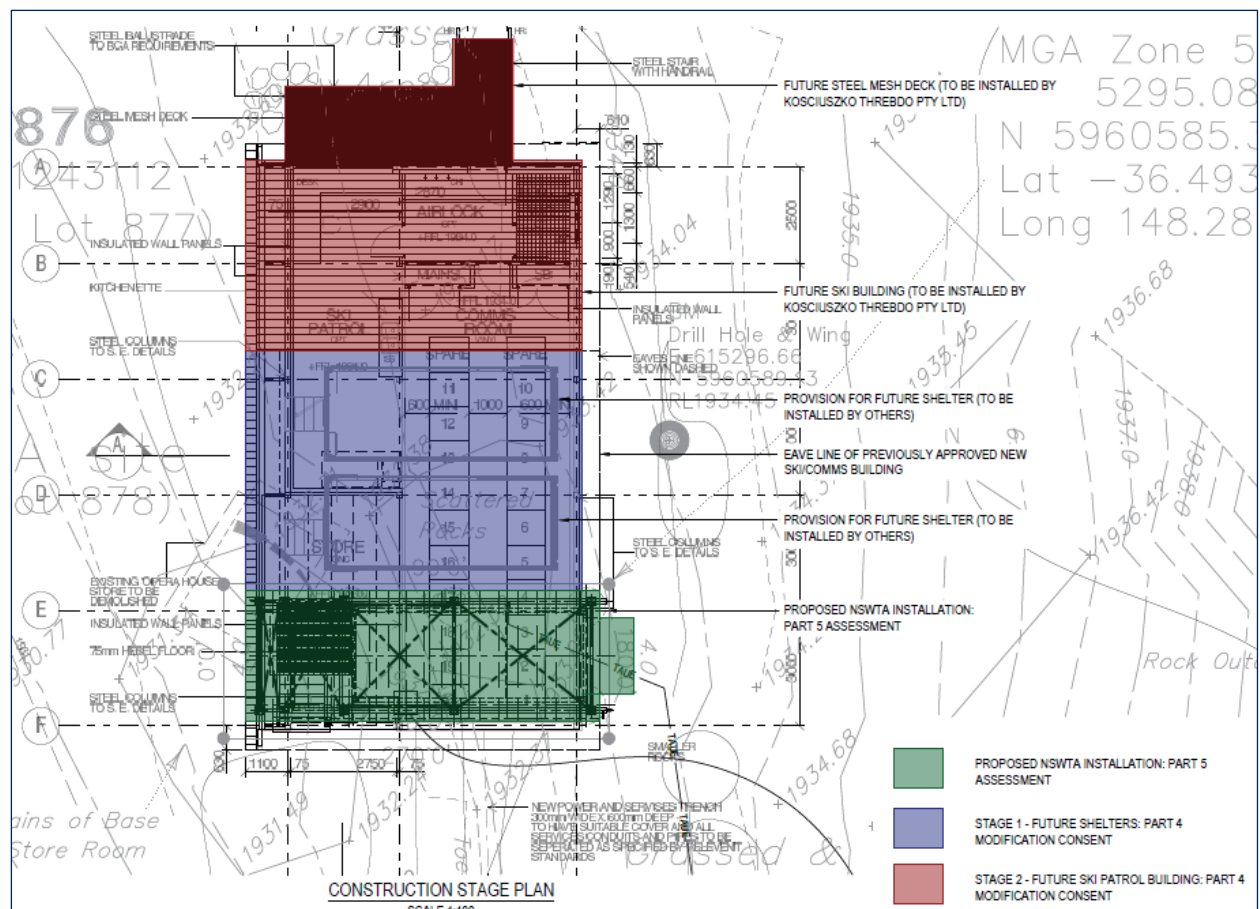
| Proposed layout of proposal (Source: Applicant’s documentation)
